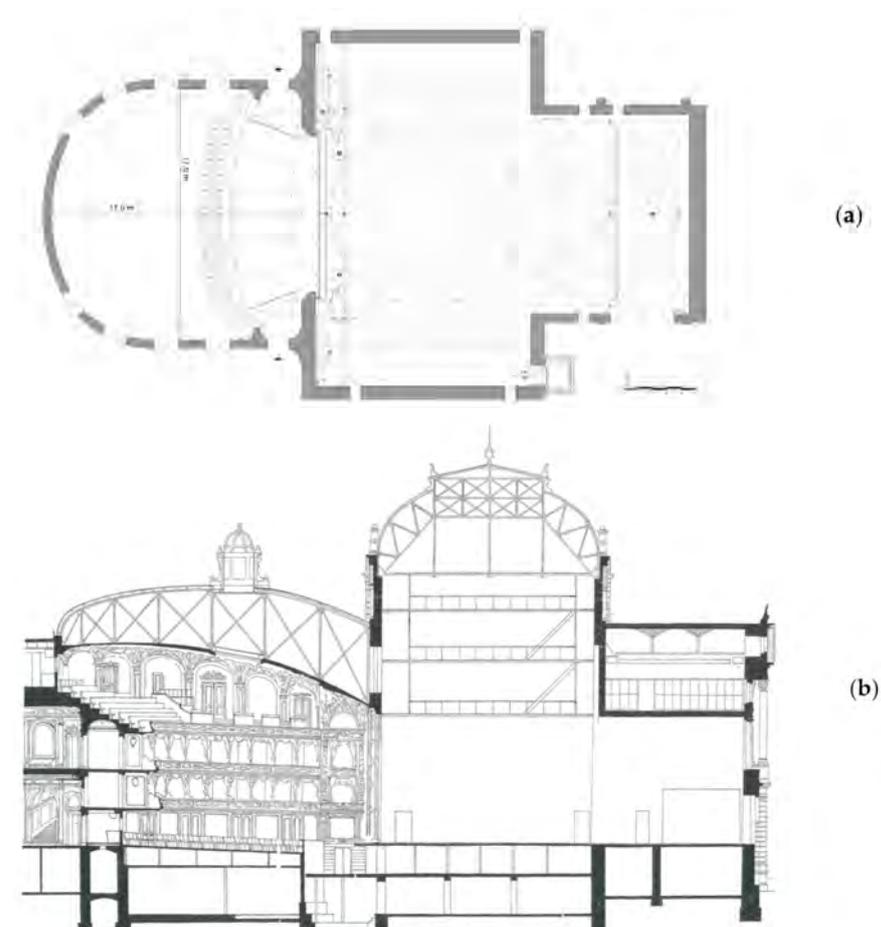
Internal organization of the National theater of Zagreb: plan layout of ground floor (a) and longitudinal section (b).
